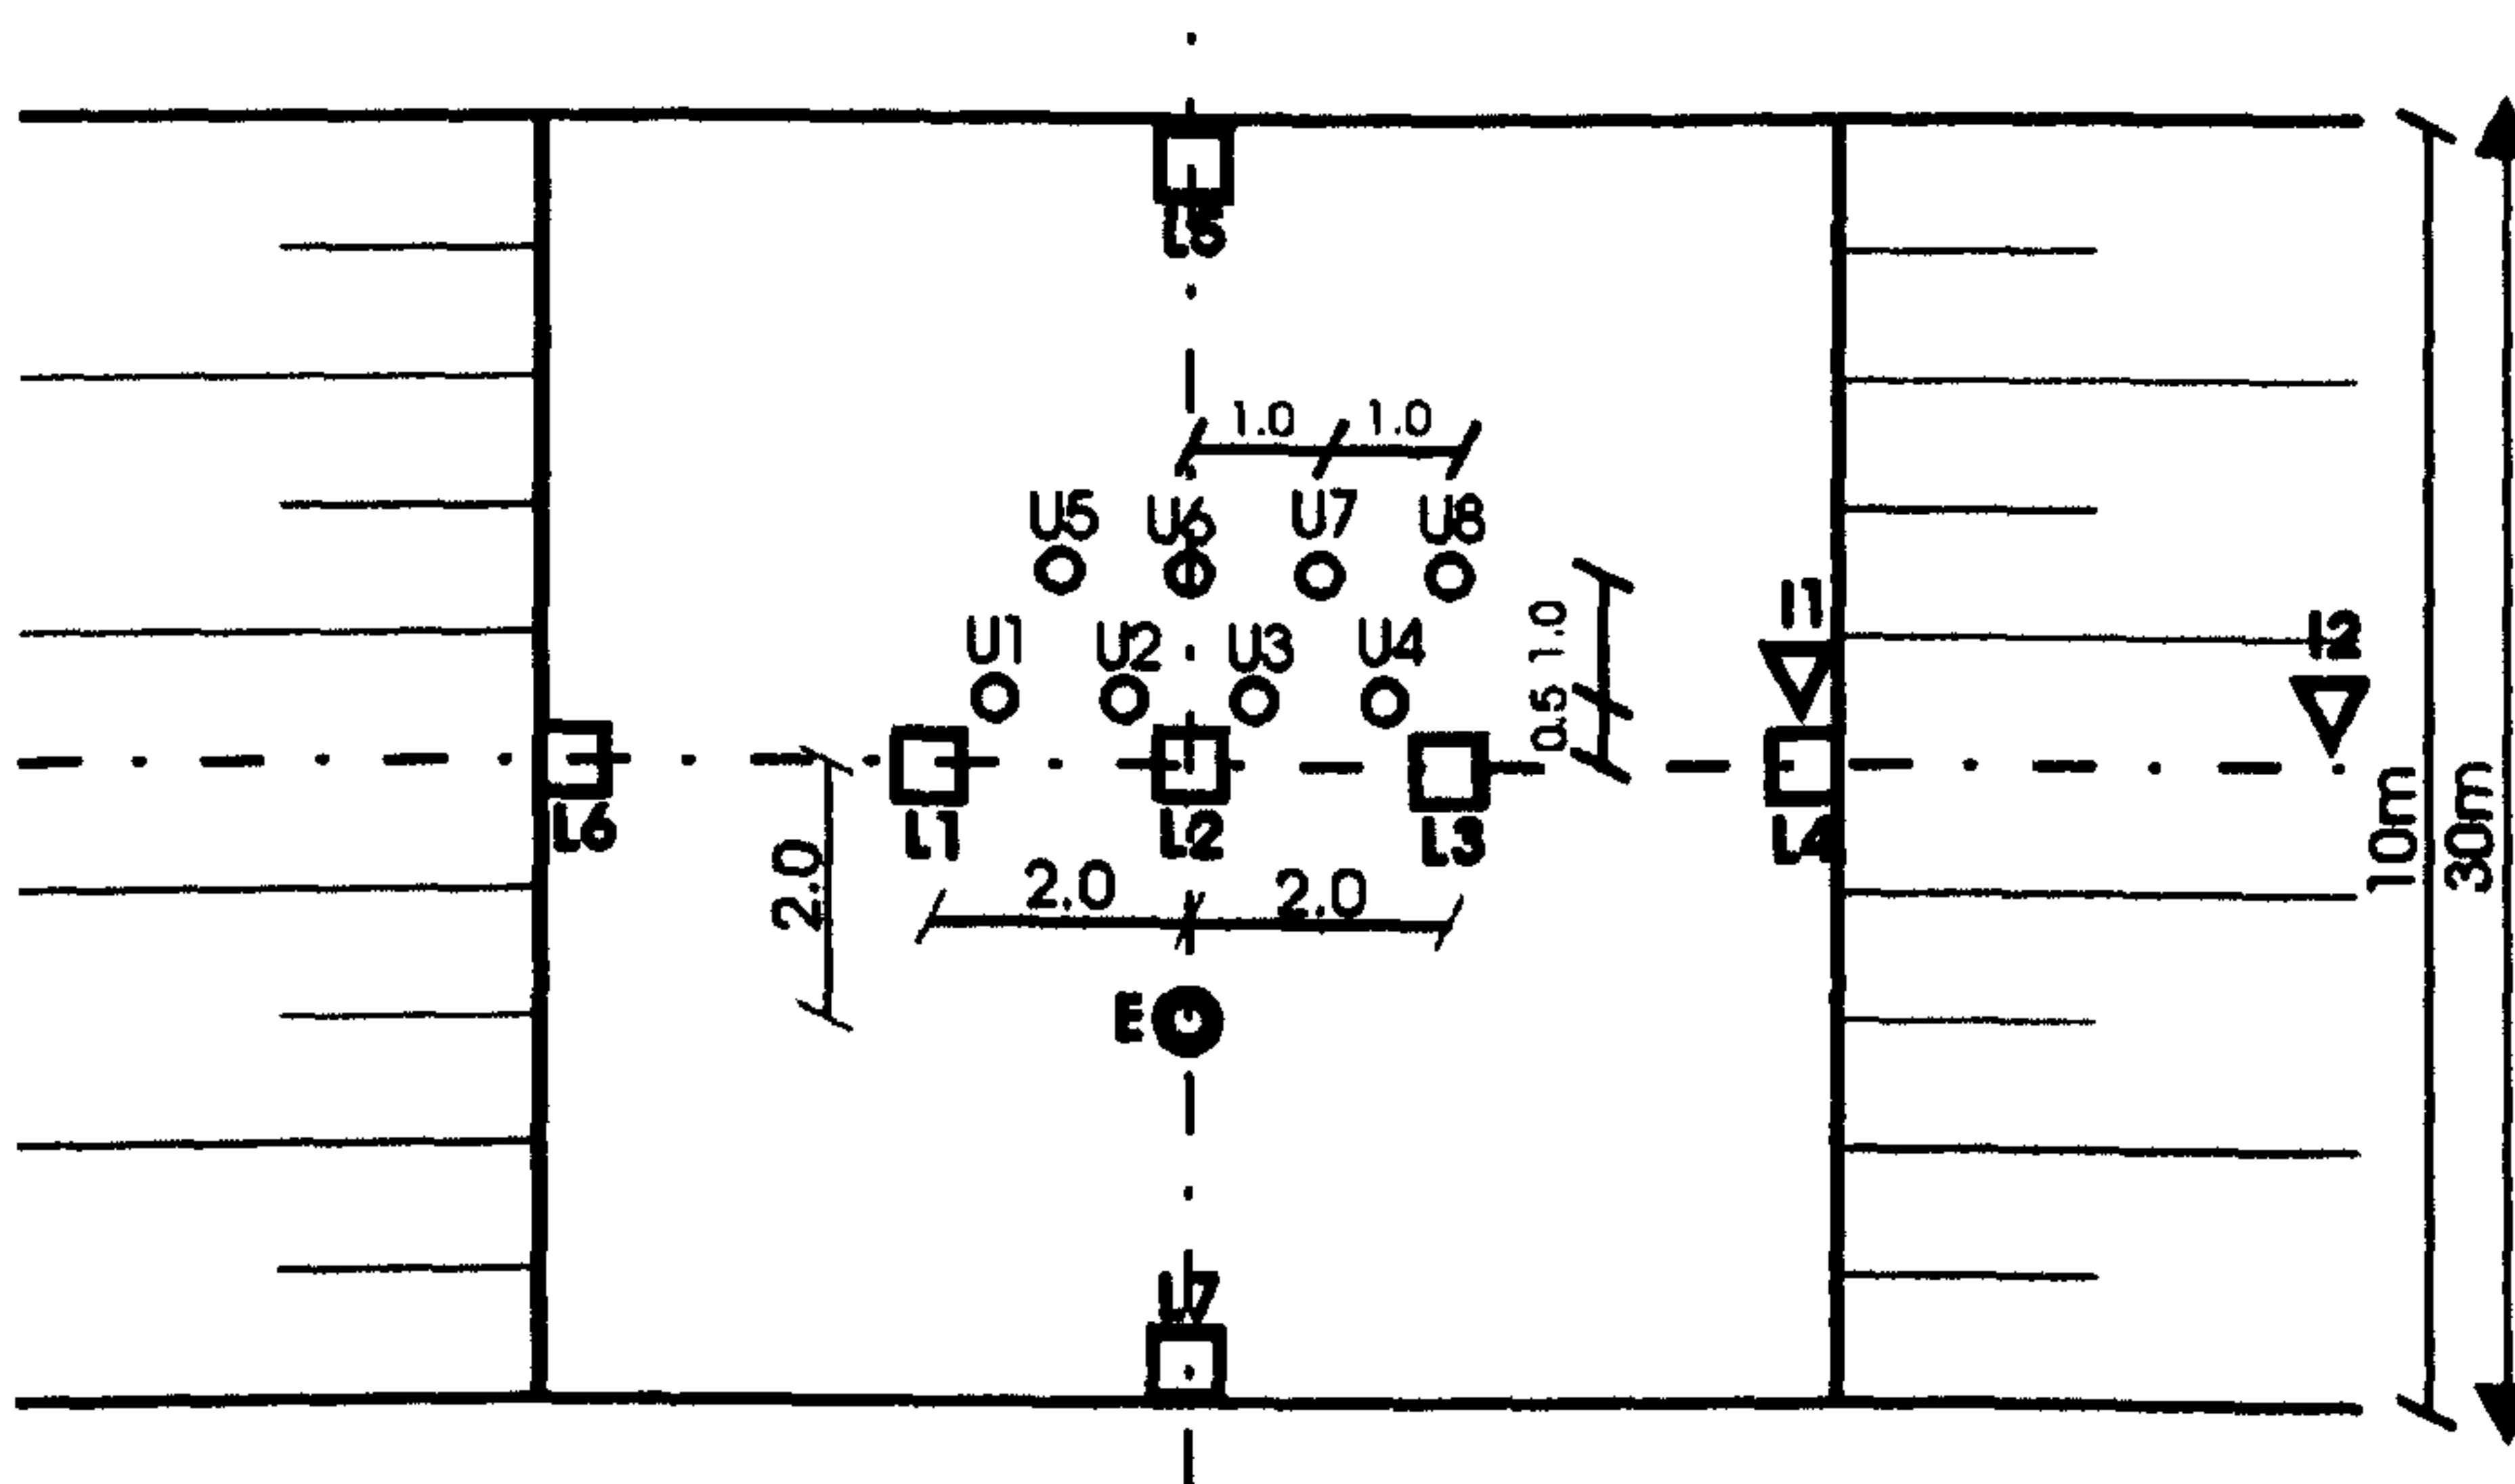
Layout of the instrumentation at the Murro test embankment
